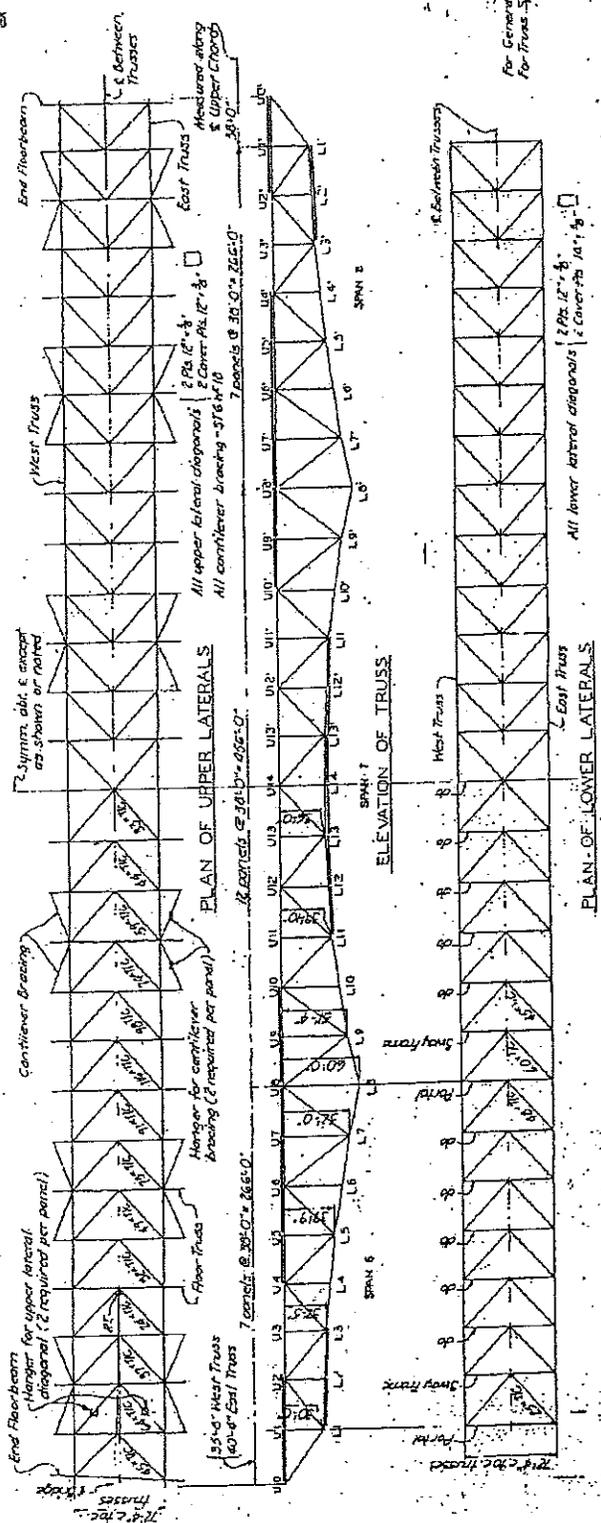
Deck Truss Framing Plan and Elevation from Original Contract Plans
